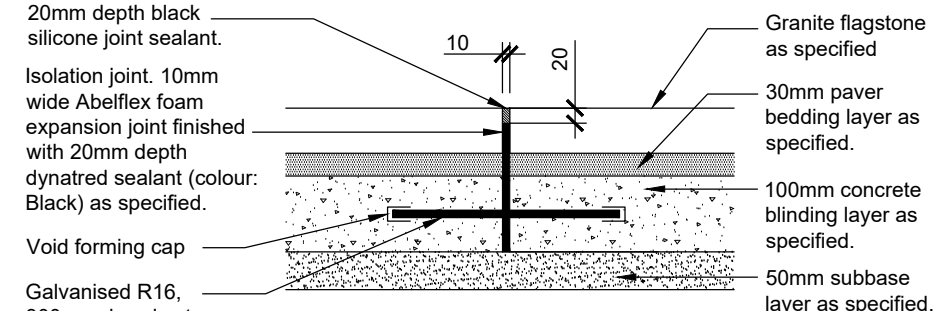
Typical Isolation Joint Detail\_Full Granite Treatment
